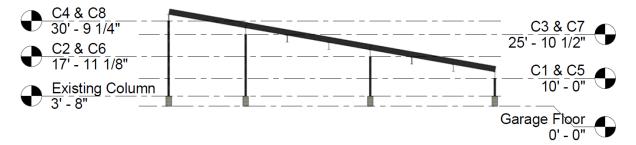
Elevation View of Columns Placed on 2 ft x 2 ft Concrete Columns
